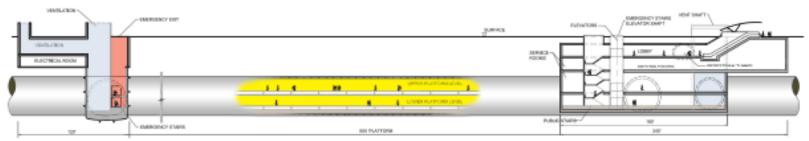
Tunnel Alternative – Ancillary Station Facilities
